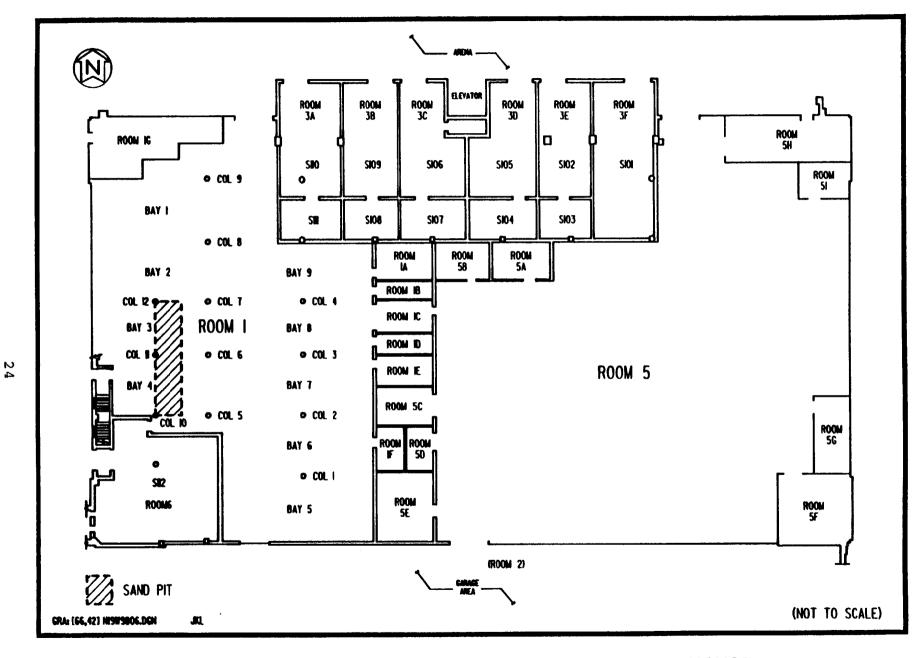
PLAN OF THE FIRST FLOOR - SOUTH HEADHOUSE
